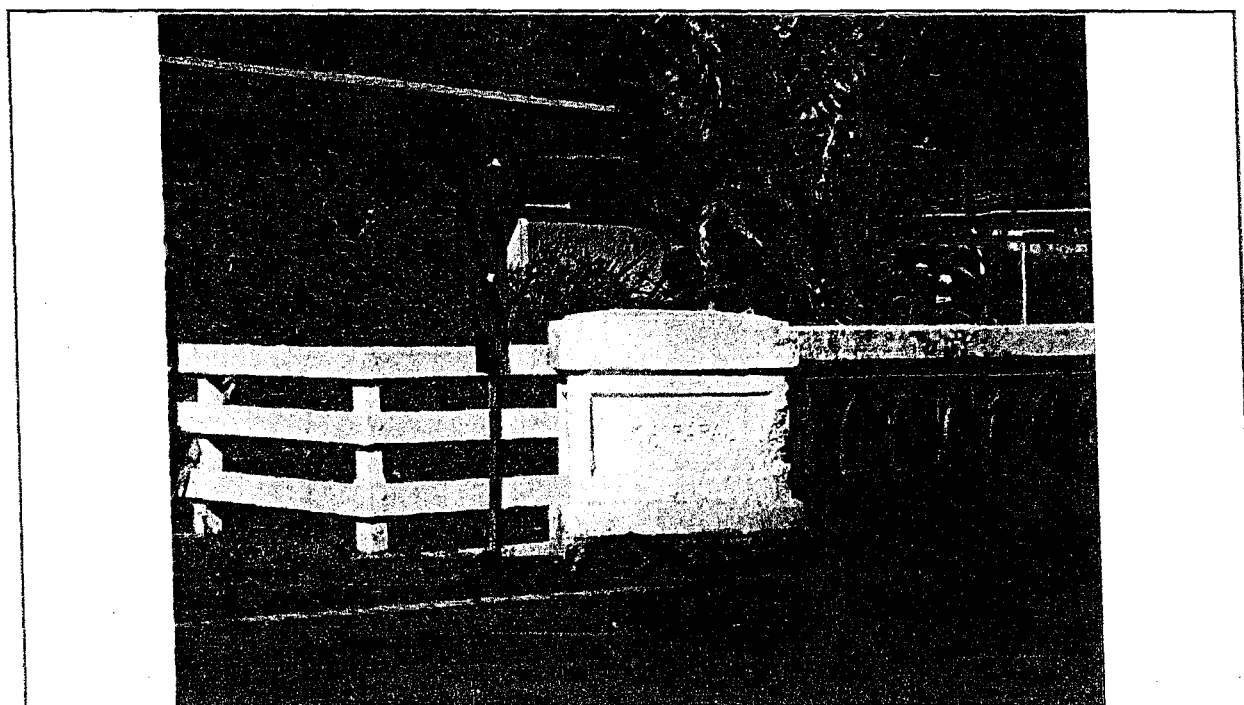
Photo of Kaipapa`u Bridge, showing 'KAIPAPAU' emblem on mauka south bridge corner, taken to west/northwest.
